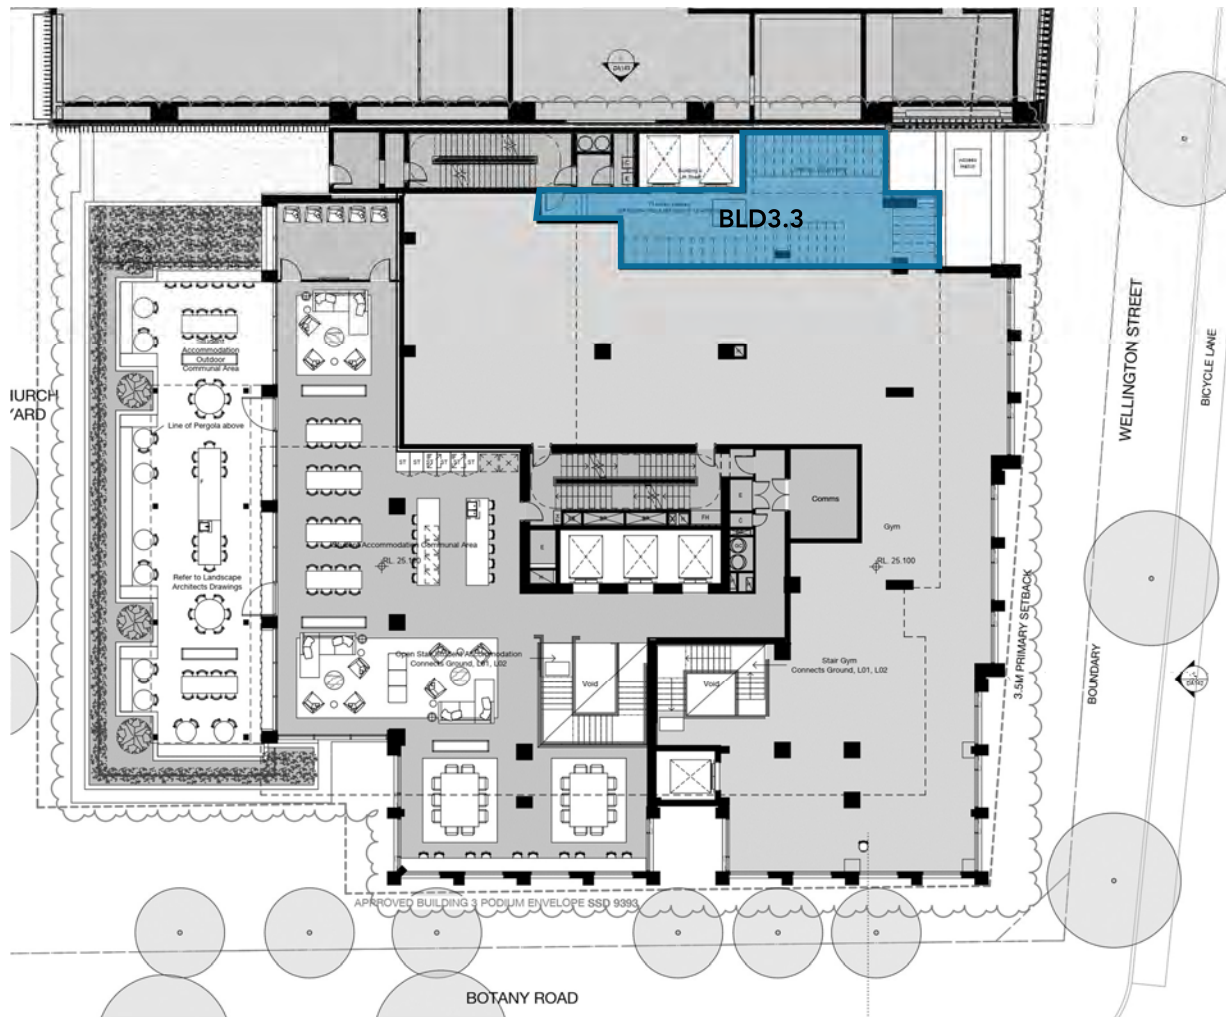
Building 3 General Arrangement Plan – Level 2, Rev K (Source: Bates Smart)
